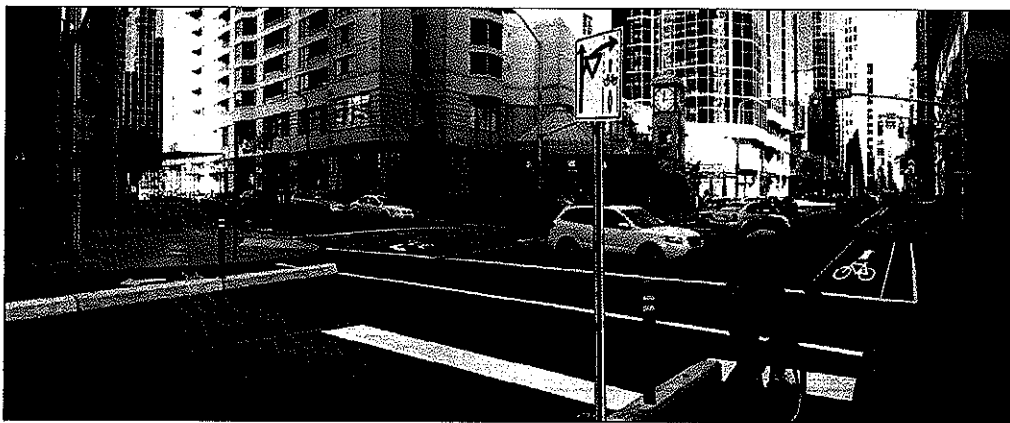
Depiction of Proposed Segregated Bike Lane Pilot Project
